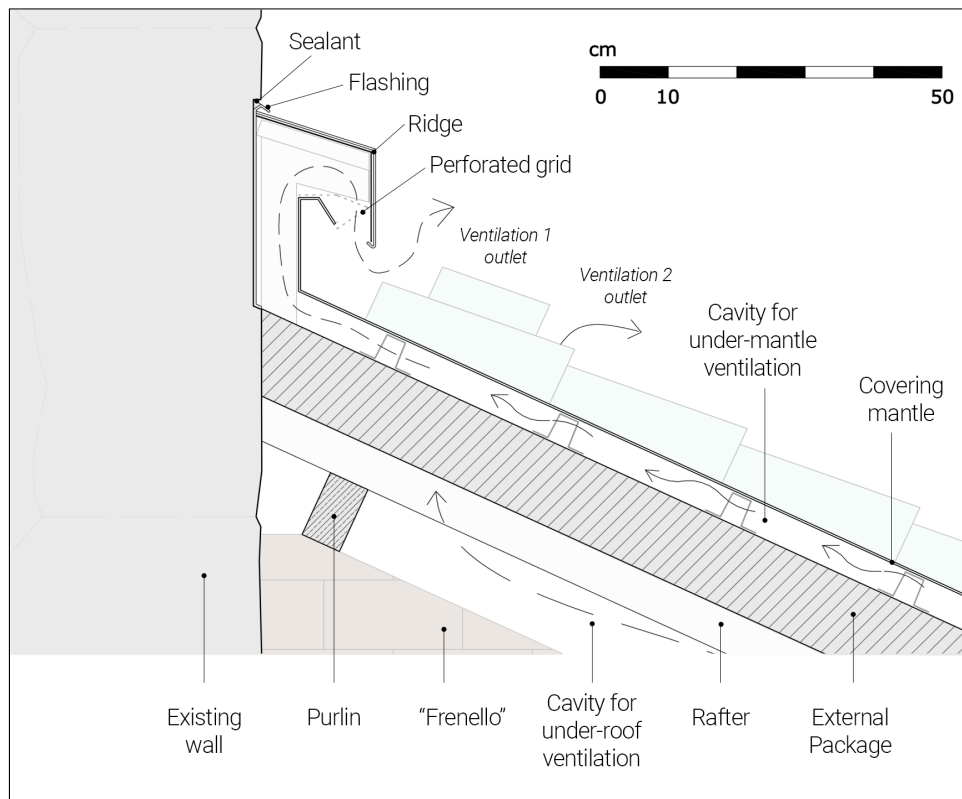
Detail of the air outlet node at the intersection with the vertical masonry for the minor arm's pitches.
